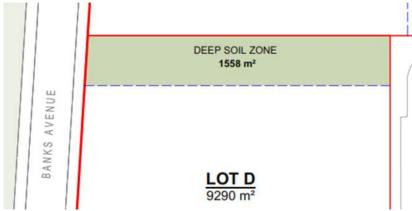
Deep soil extract from approved Concept Plan (DA-2019/386)
